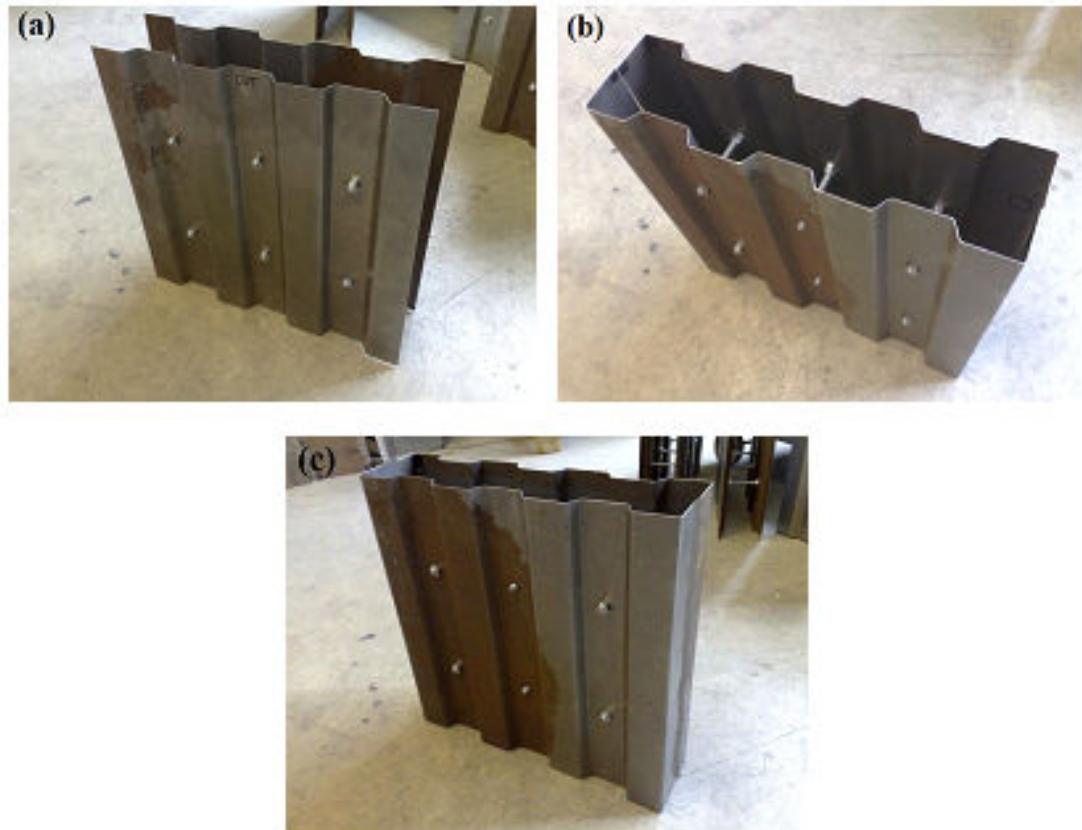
Steel sheeting edge conditions (a) no stopping edge (b) with stopping edge (c) with welded stopping edge
